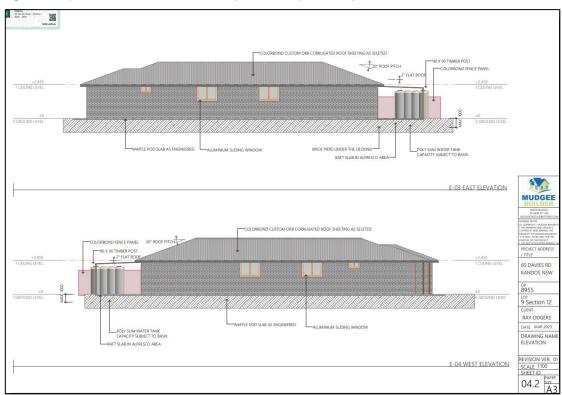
Proposed east and west elevations (source: Mudgee Builder)
